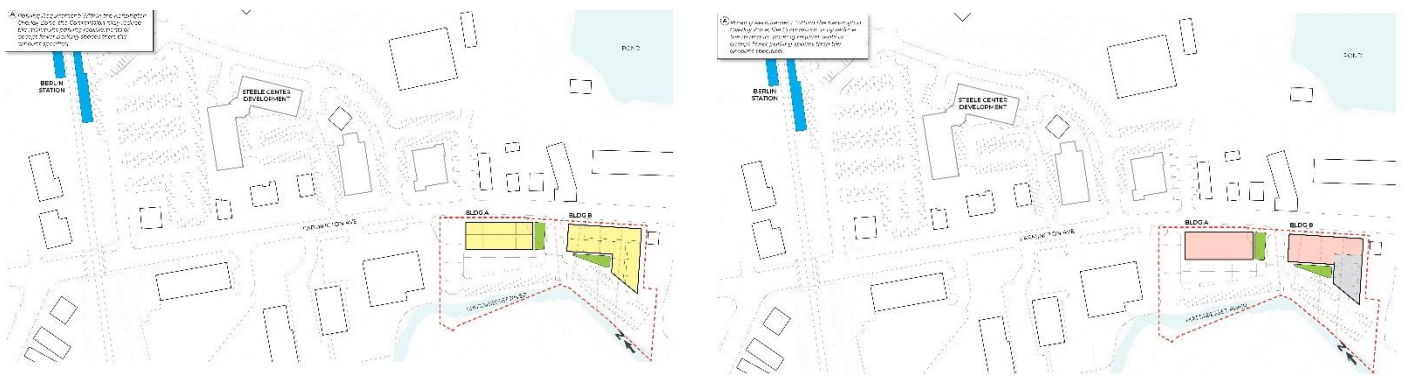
Berlin Station TOD Test-Fit Ground Floor and Aerial Plans
